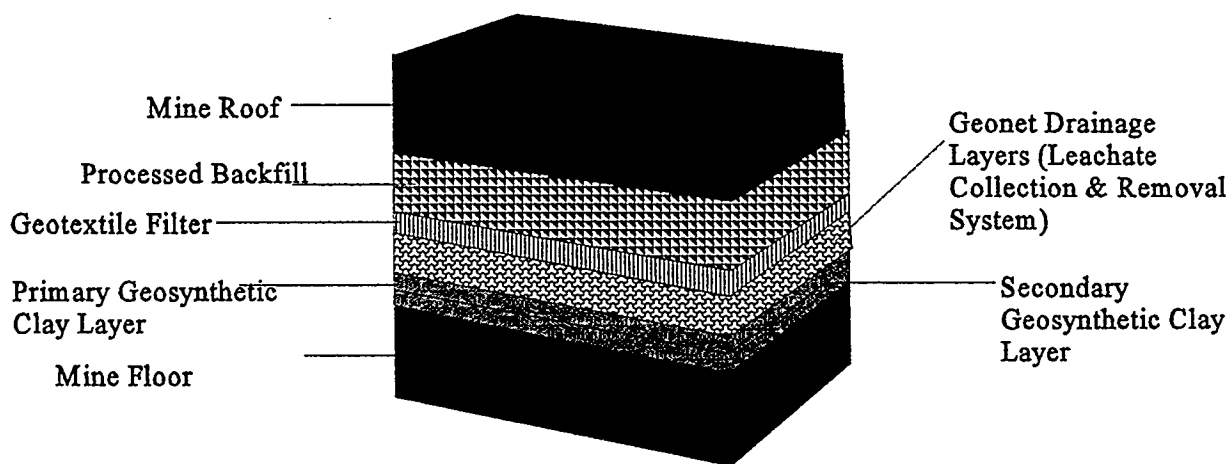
Structure of Bottom Barrier for Remote Longwall Mining In Situ Containment.
